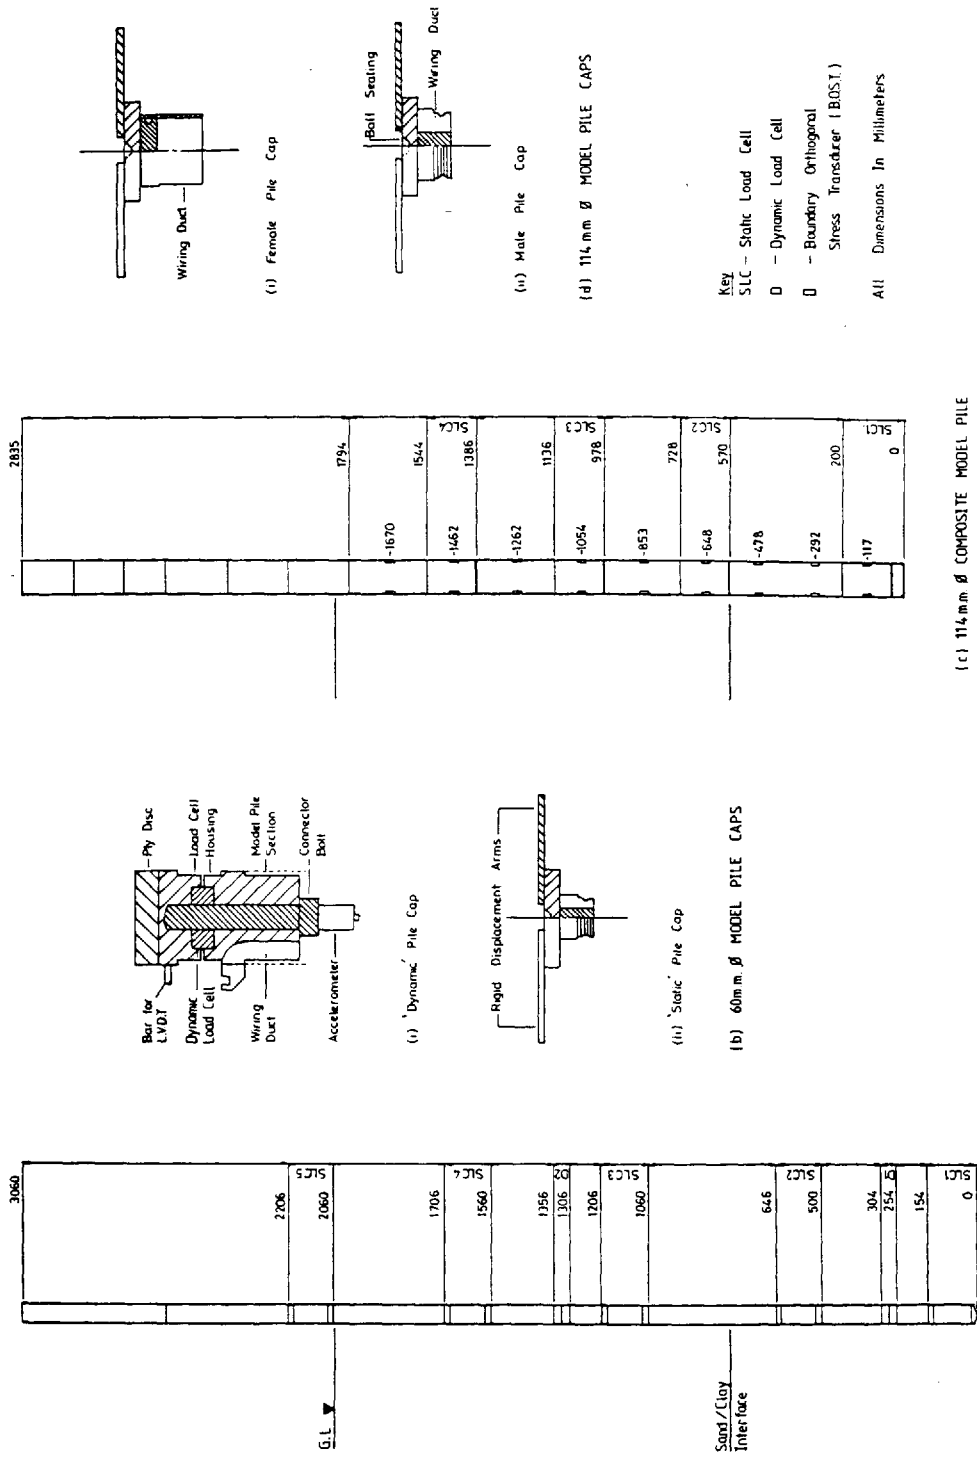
GENERAL DETAILS OF THE SEMI-FULL SCALE PILES AND PILE CAPS
